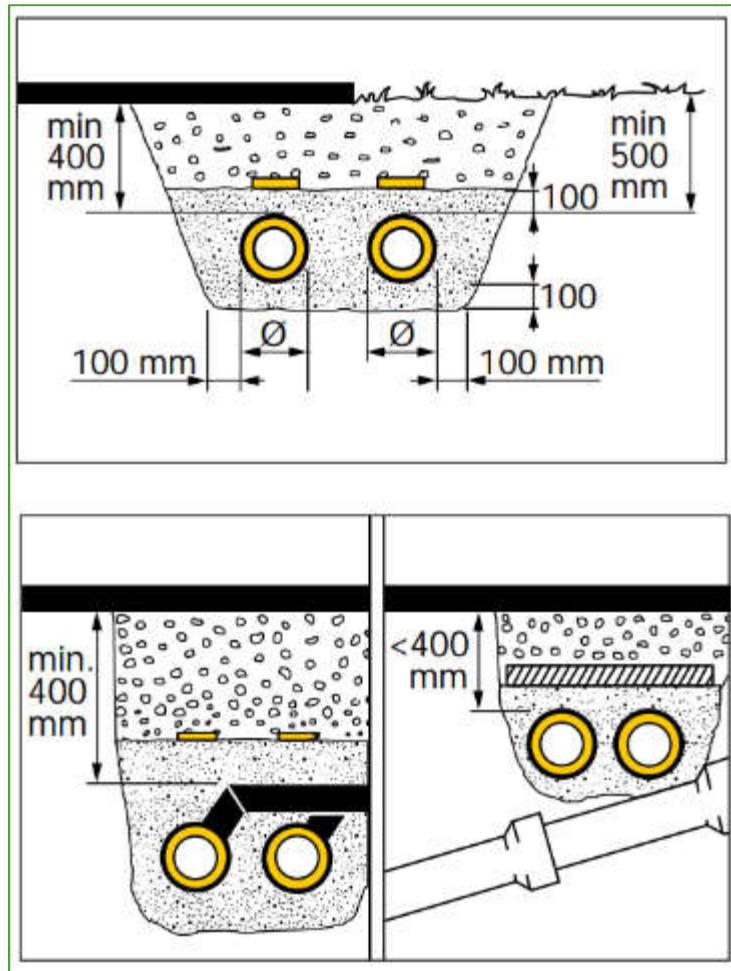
Logstor Design Manual - Minimum Soil Cover Recommendations (bottom, Branch Cover Depth) [31]
